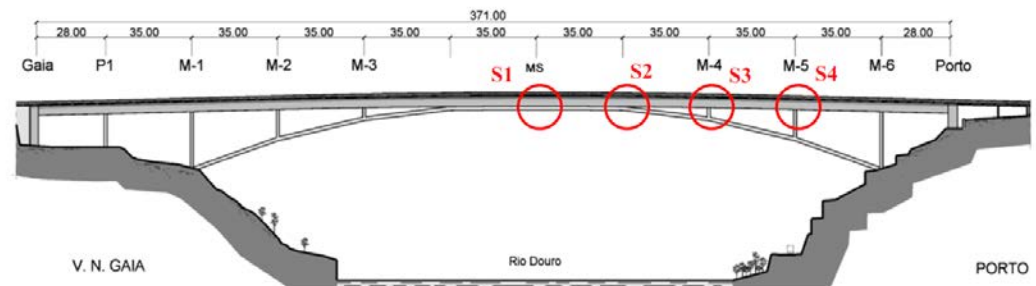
Elevation of the bridge showing the instrumented sections: S1–S4.
